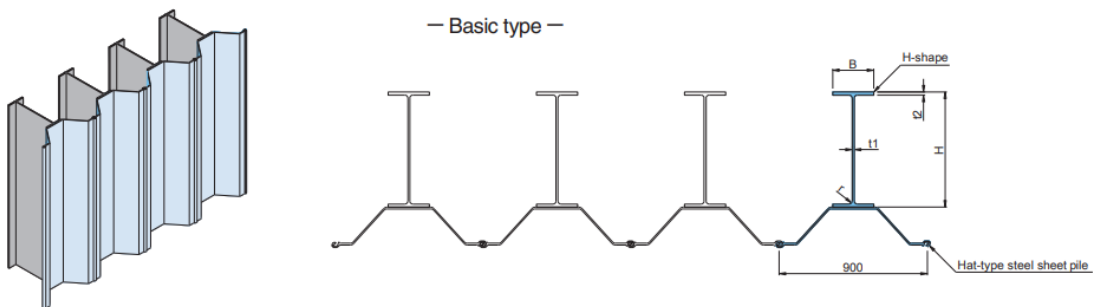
combined type (H beam +hat type steel sheet pile)
